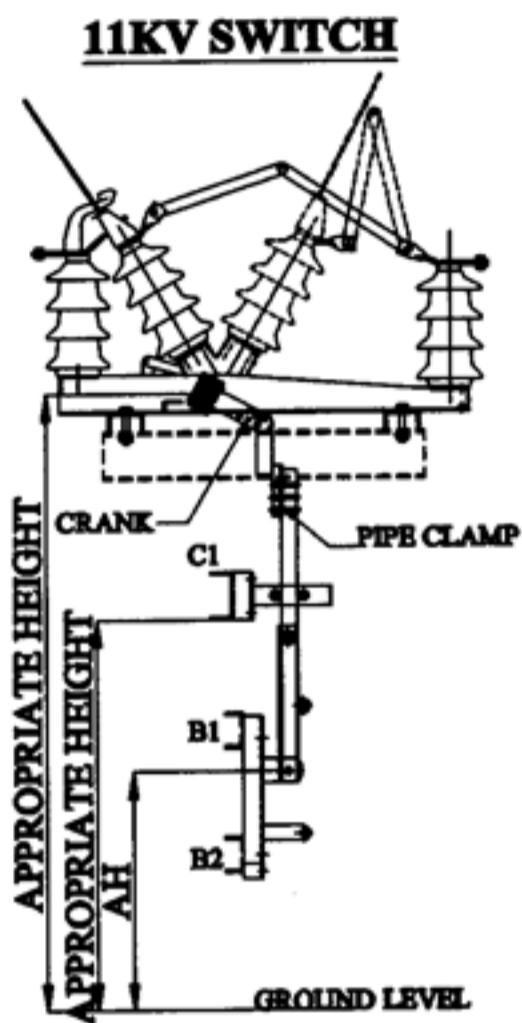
DETAILED INSTRUCTION FOR MOUNTING / INSTALLATION
